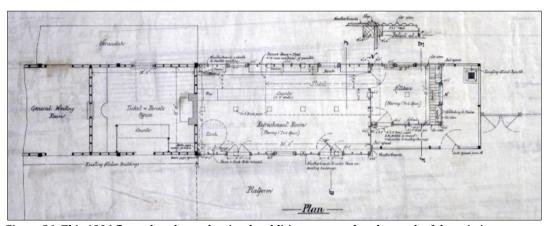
This 1906 floor plan shows the simple addition proposed to the south of the existing. ARHSnsw
